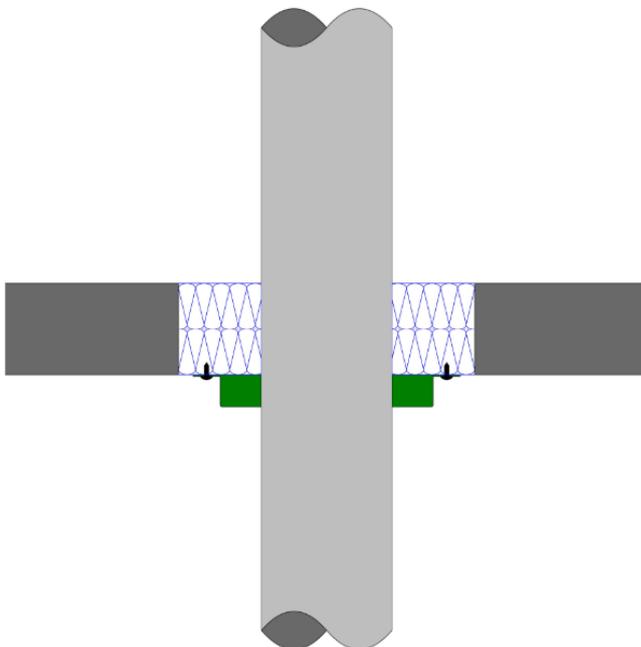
Typical installation of pipes fitted perpendicular through a batt sealing aperture in a floor system with BOSS MaxiCollar™ installed on the exposed face with 0 annular gap
